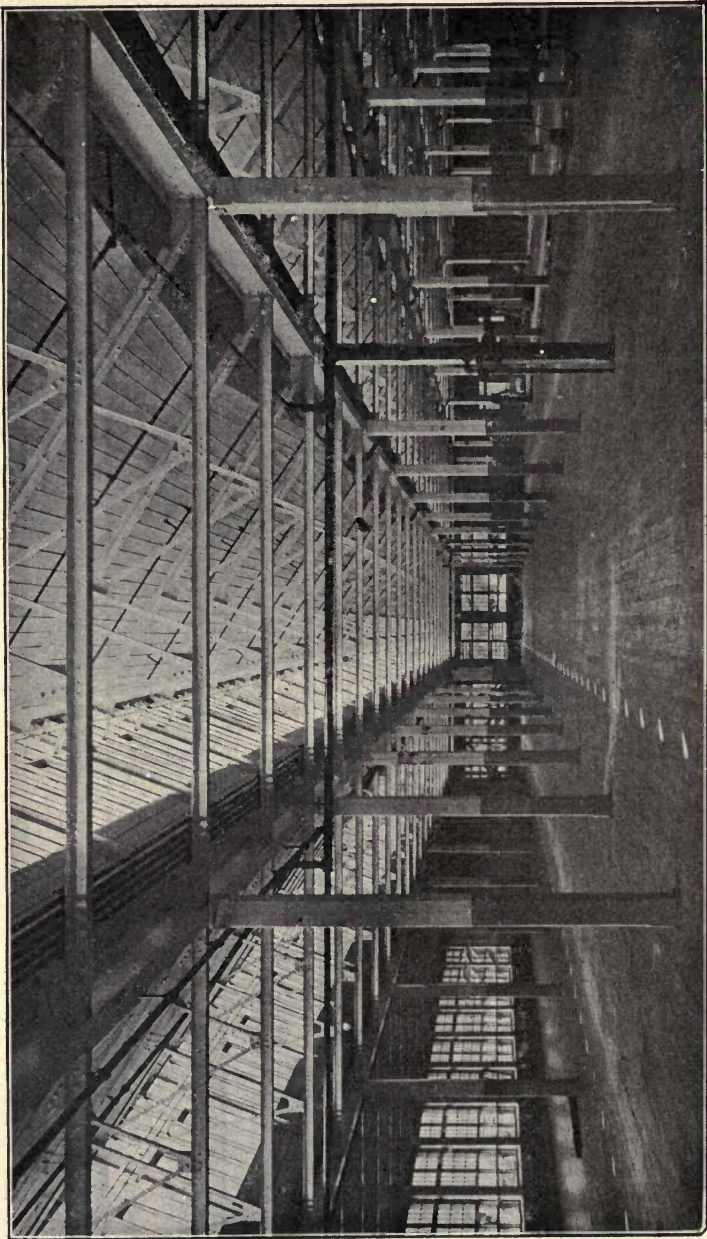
Interior of shop of Blake & Johnson Co., Waterville, Conn., showing light distribution in a typical saw-tooth roof shop.
